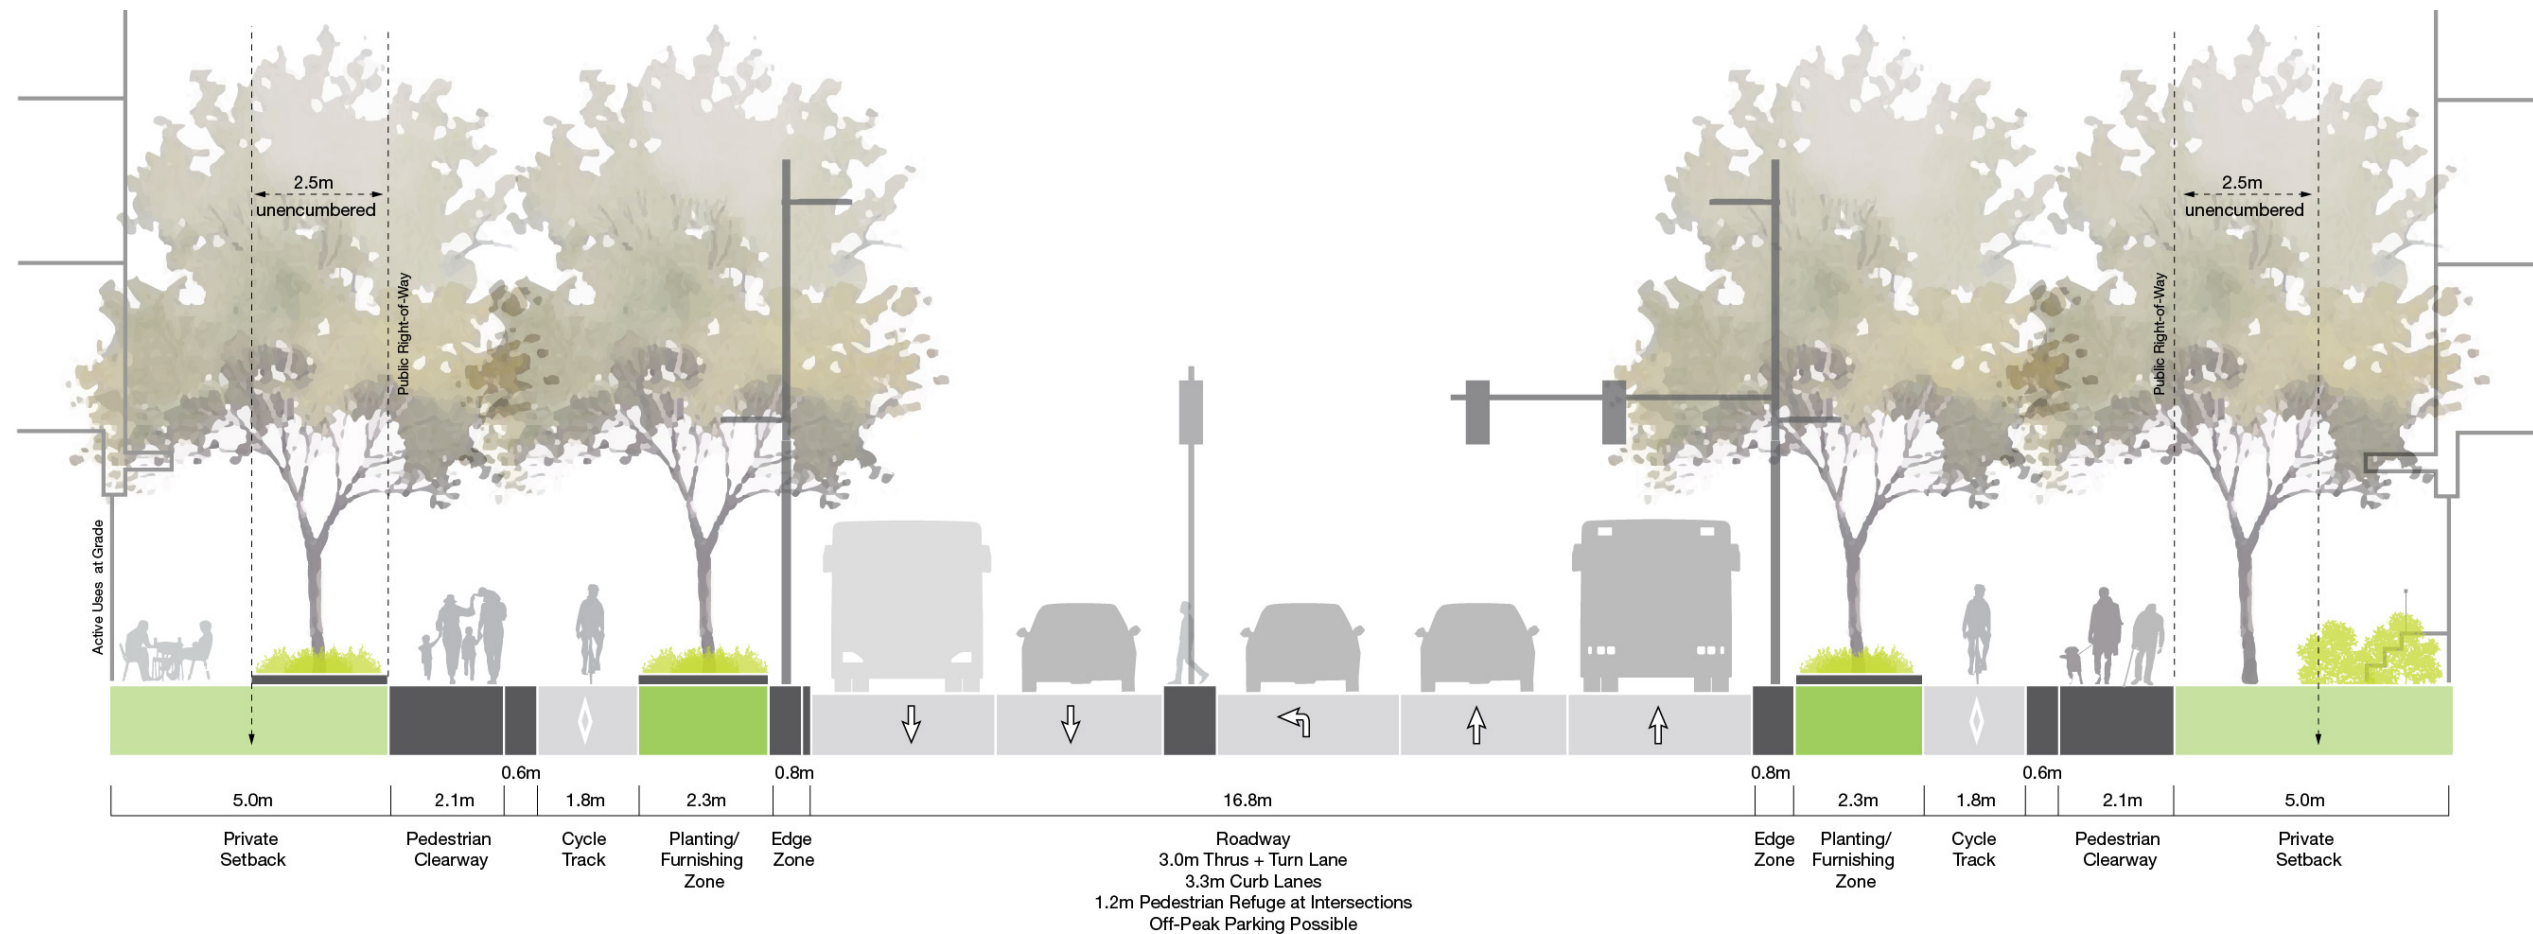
Bushby Drive Cross Section 30m ROW
